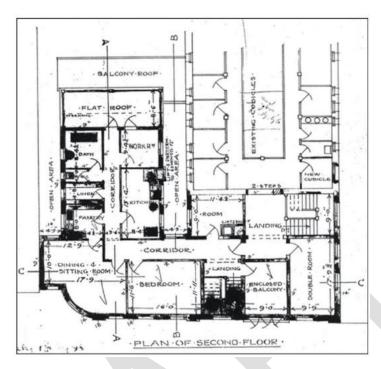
1925 Second Floor plan showing the proposed alterations to the original wing, including the addition of a new cubicle (made possible by the removal of the original access stair) and proposed northern wing occupied by the Superintendent's quarters. (Source: City of Sydney Archives, 0540/25)
